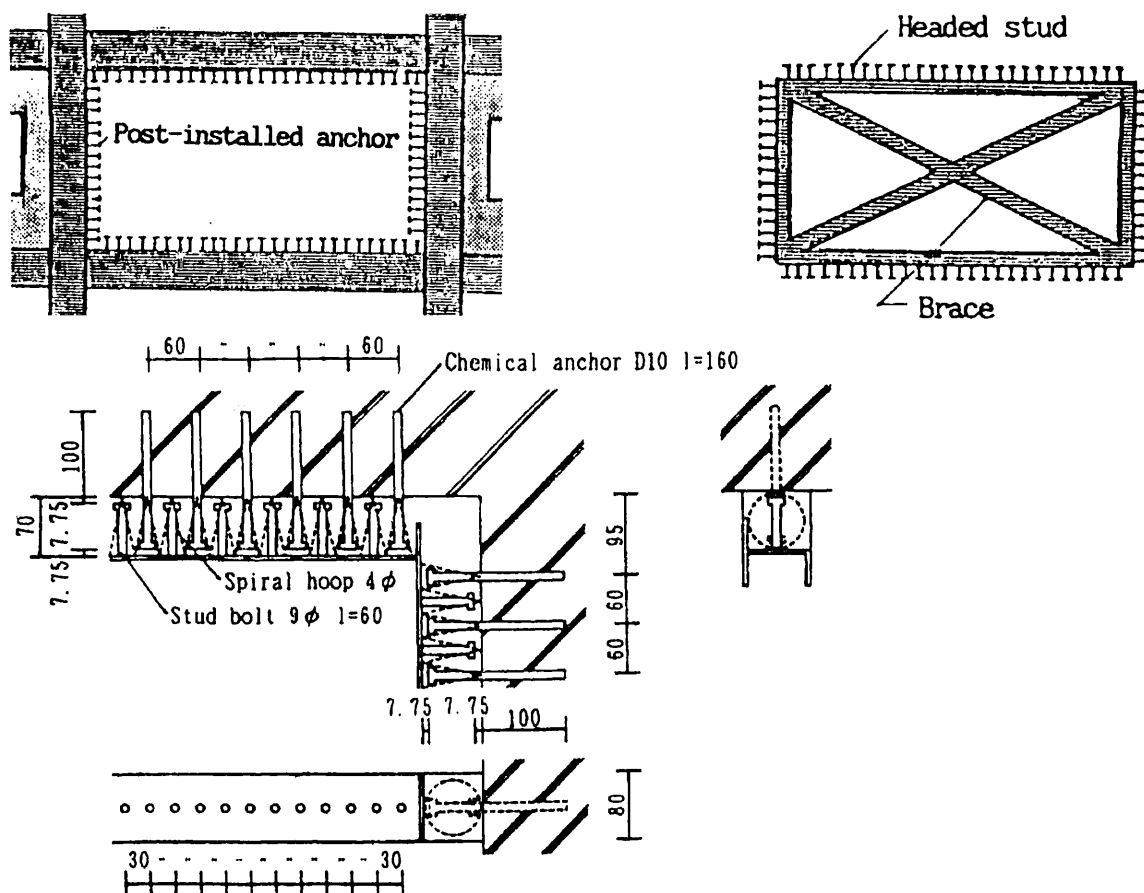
Prefabricated steel bracing according to Yamamoto (1993): (a) post-installed anchors and shear studs for the connection; (b) detail of joint between steel rim and concrete frame.
